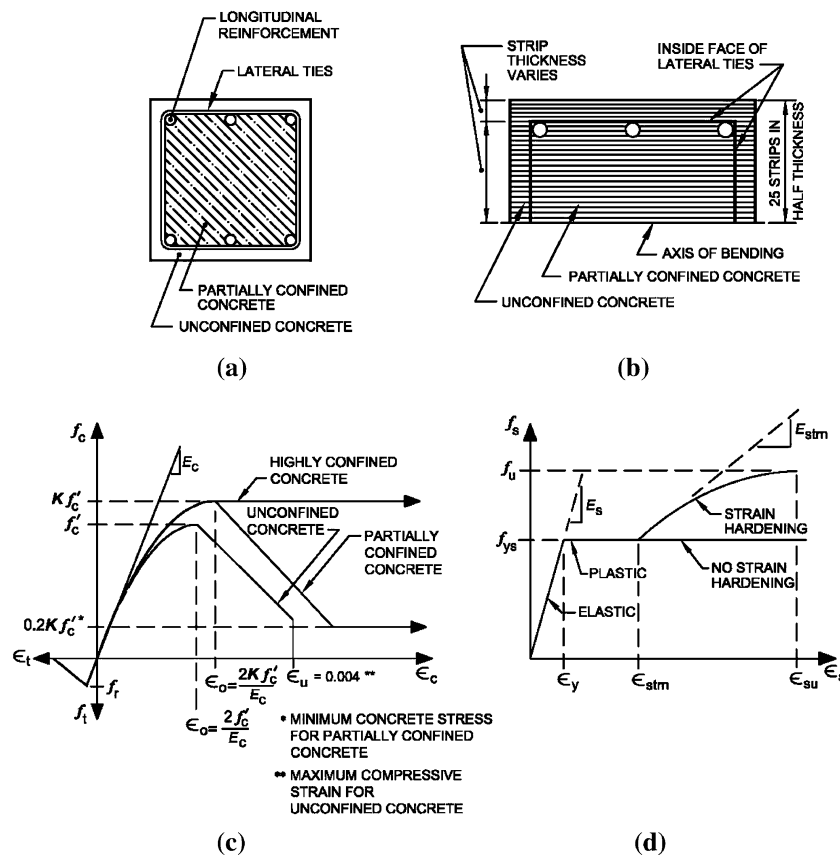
a Details of reinforced concrete cross section used; b discretization of one-half reinforced concrete cross section used for computing theoretical strength; c schematic concrete stress-strain curves used for
